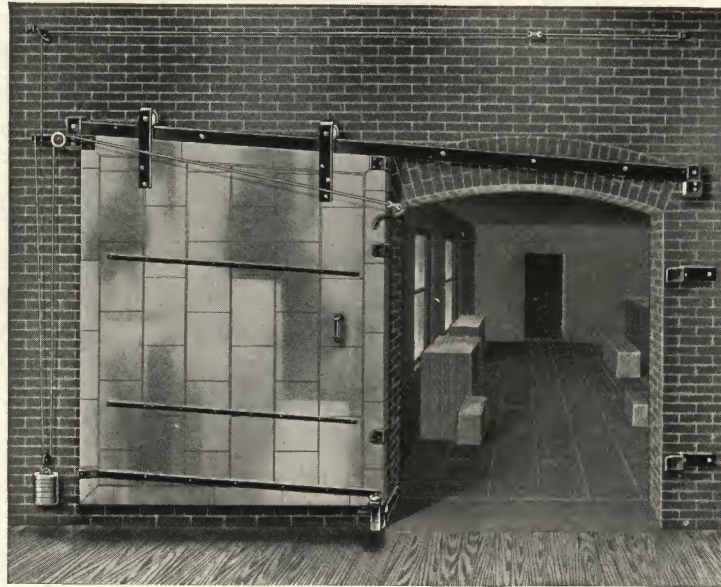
No. 102 Fire Door Fixtures Applied to Left Hand Tin Clad Fire Door
